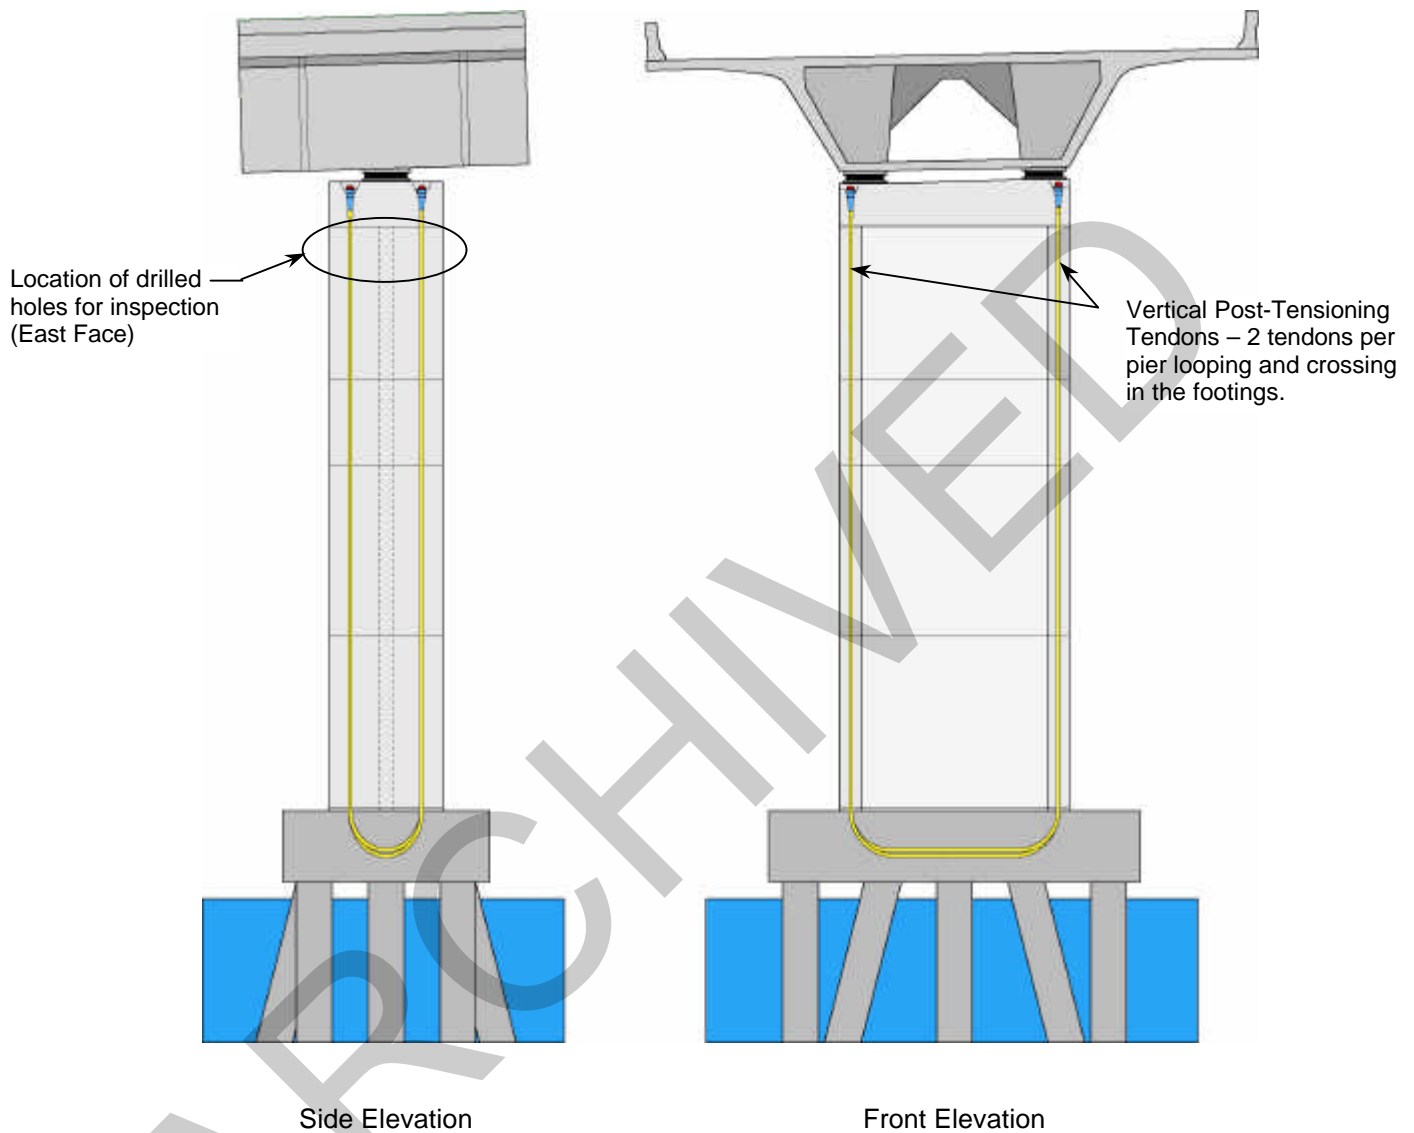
Side and Front Elevations of Precast I-Piers
